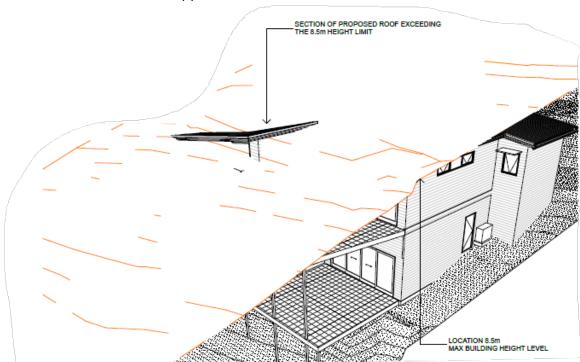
Detailing the extent of dwelling encroachment of the 8.5m height control
